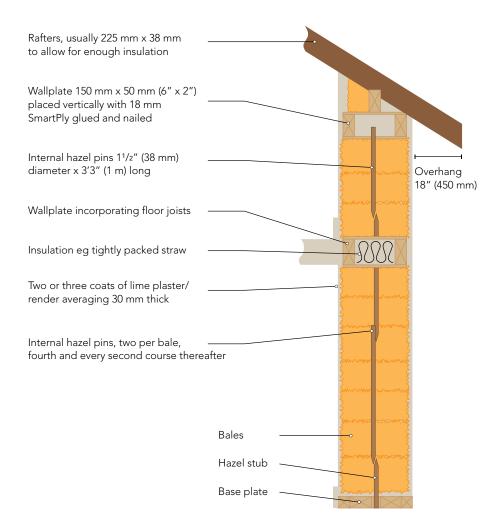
Section through a Nebraska System, straw bale wall^[15]
